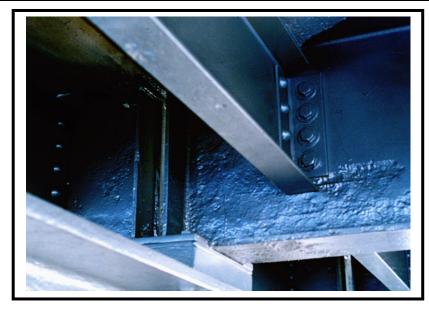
4-90: Painted-Over Section Loss on Girder Web
